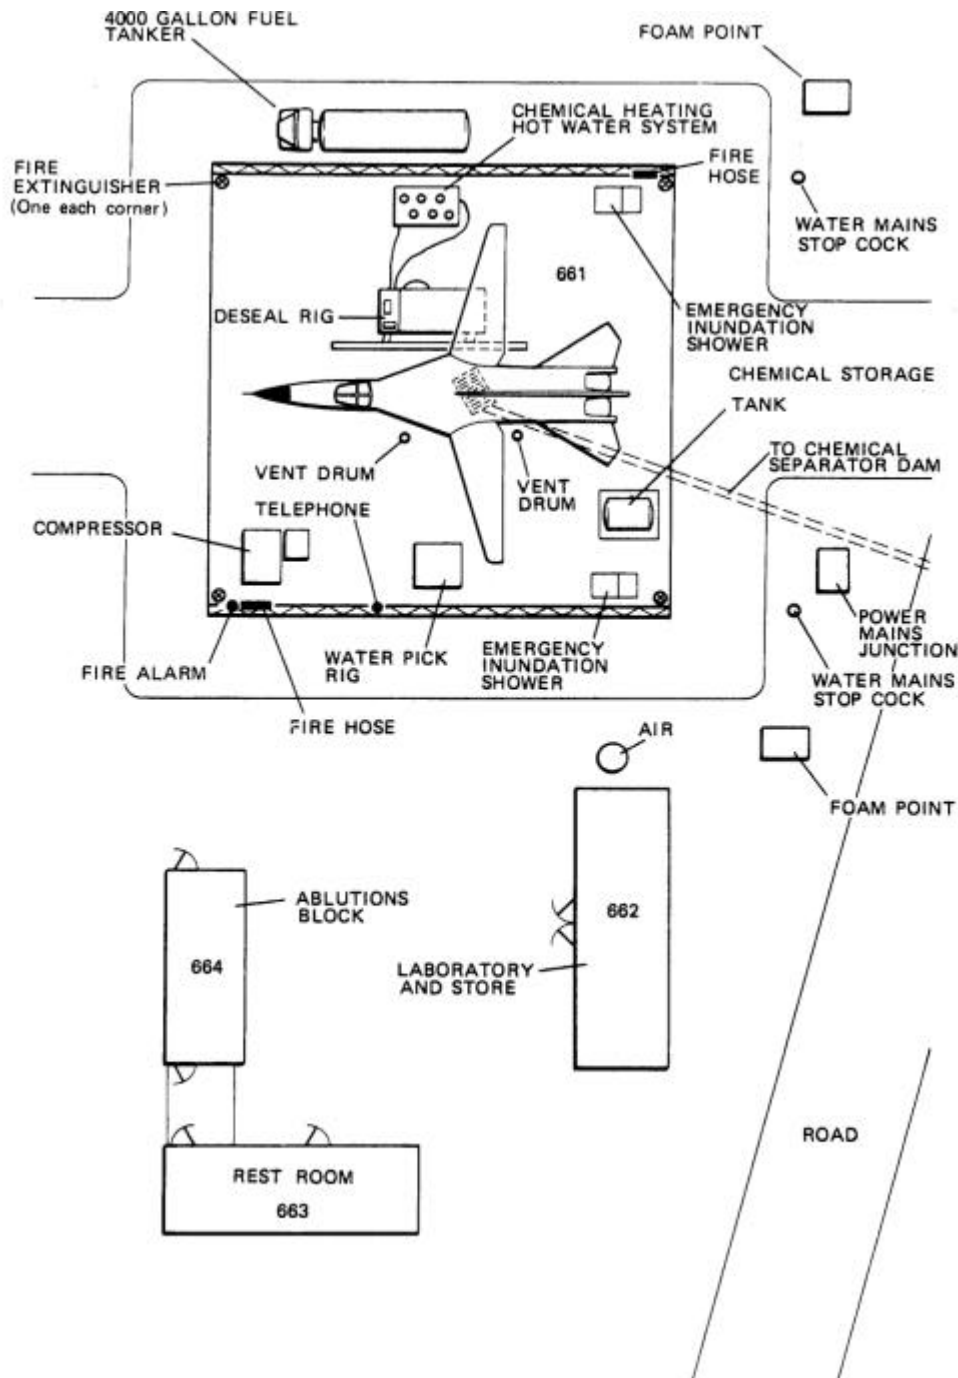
Layout of Building 661 Deseal Facility (Rag Hangar)²³
